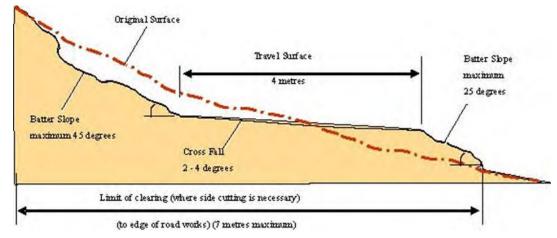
Access Track Infrastructure - Side Cutting Formation Details
